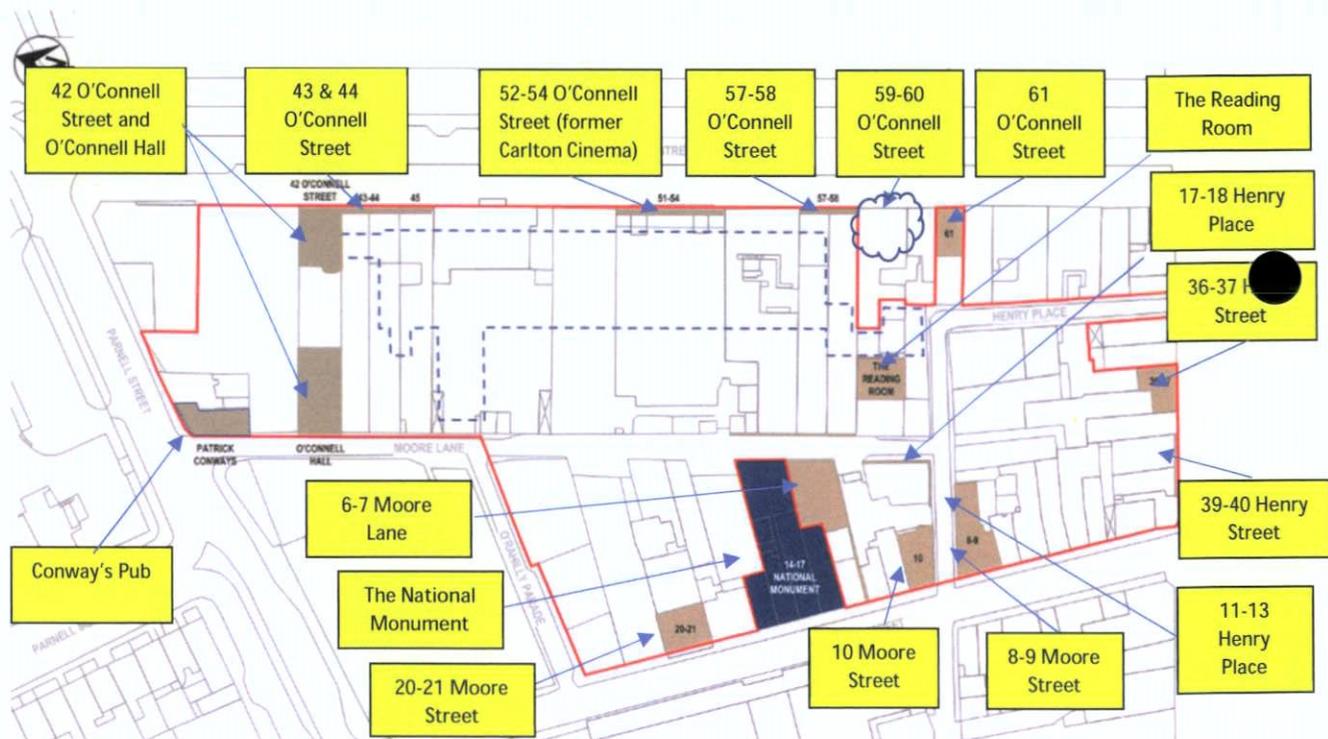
Protected Structures and non-protected structures proposed to be retained.
